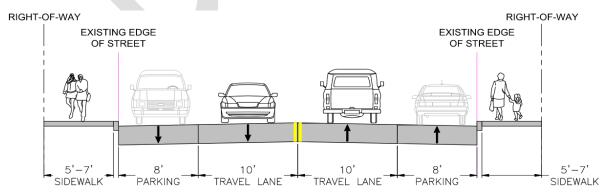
Coleman Avenue Existing Cross Section (City of Menlo Park) Looking East Toward Willow Road
